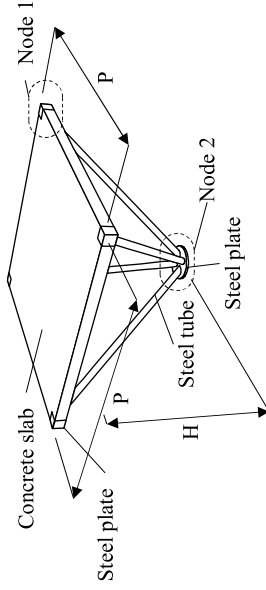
The steel-concrete space units of the steel and concrete composite cable space frame
